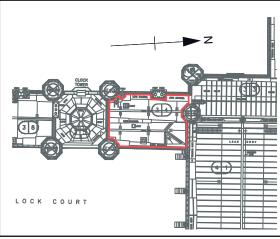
Hampton Court Palace, Base Court V, Plan on main roof
